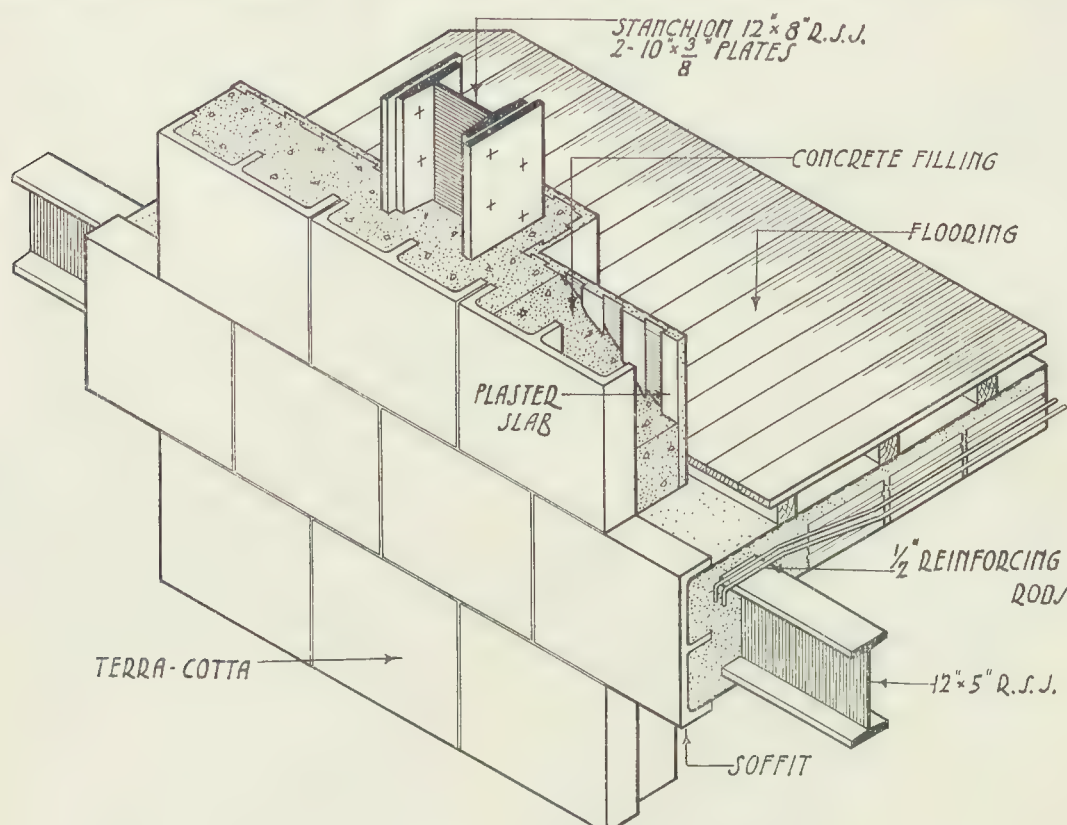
CONCRETE WALL FACED WITH TERRACOTTA
